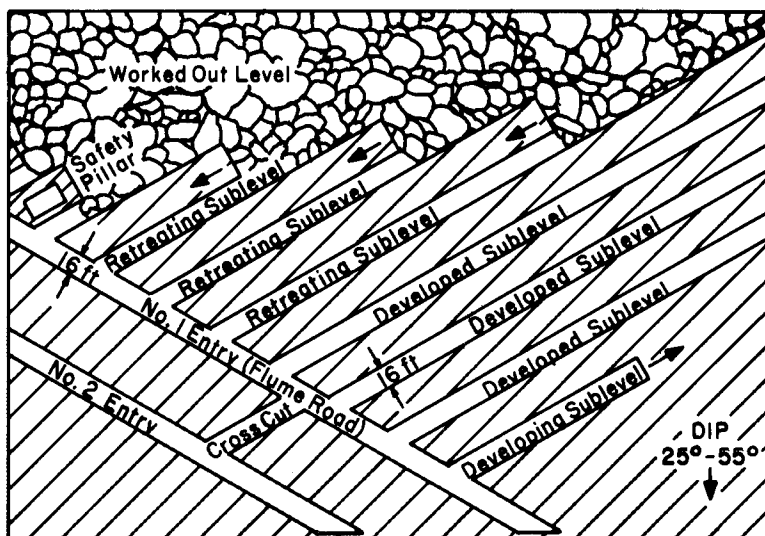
PLAN VIEW OF PANELS, HYDRAULIC MINE
